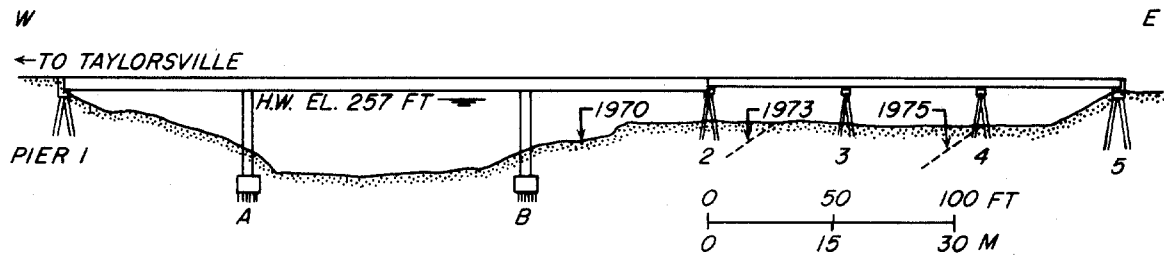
Elevation sketch of new SR-28 bridge, showing bank recession at pile bents.
